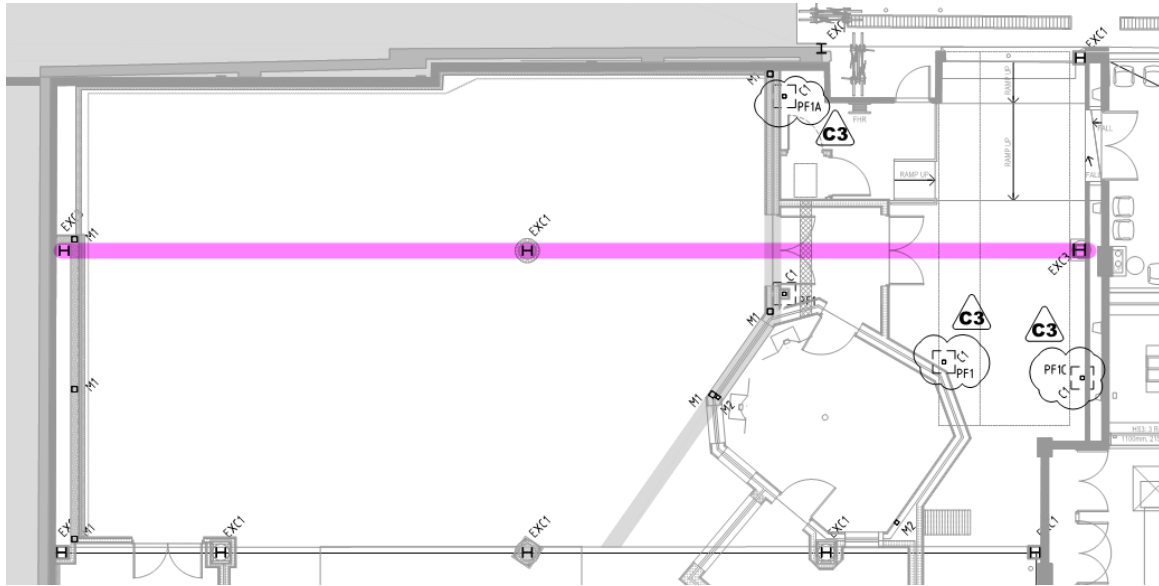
Alignment of existing portal frame under review highlighted in pink, excerpt from structural drawing, Job No. S49952_271057, Drawing No. S10 (Rev C3), prepared by FMG Engineering, dated 2024-01-18
